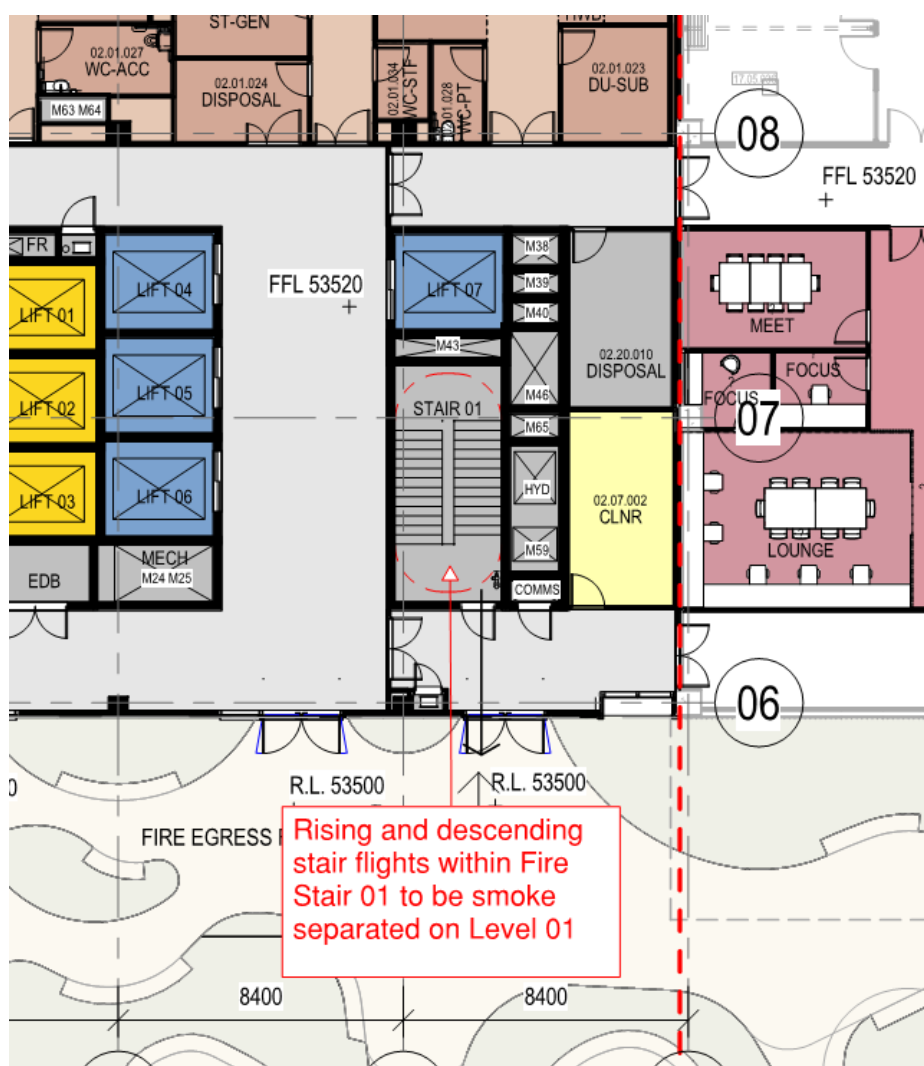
Rising and descending stair flights within Fire Stair 01 to be separated
